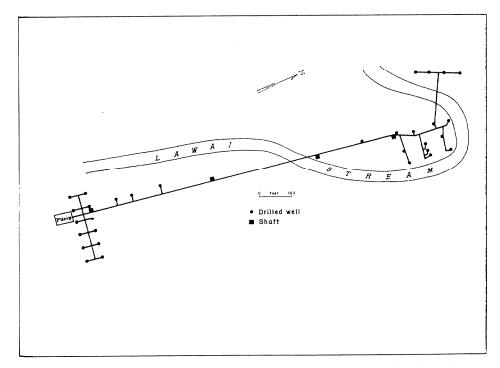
Plan of the tunnel system at shaft 3, McBryde Sugar Co. Lawai pump.
